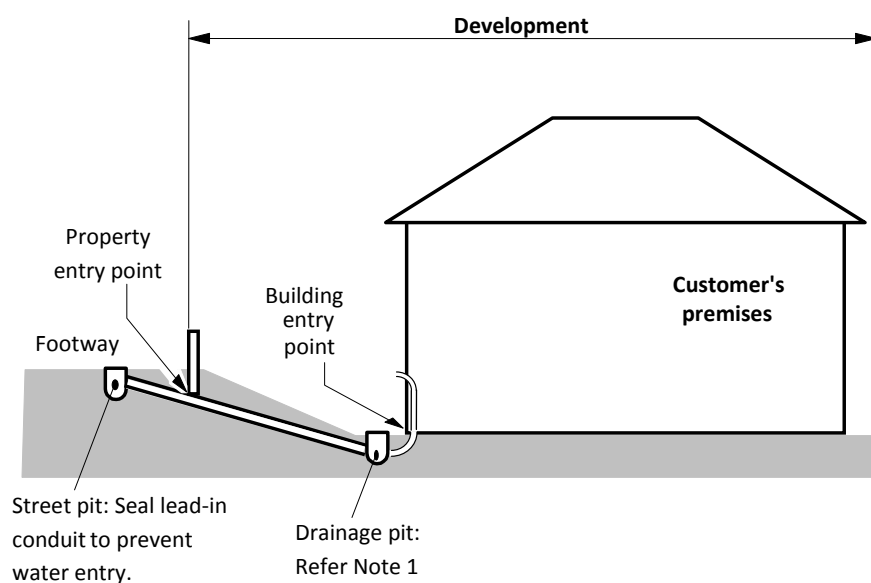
Building Entry Point – Conduit Placement (P23 only)
